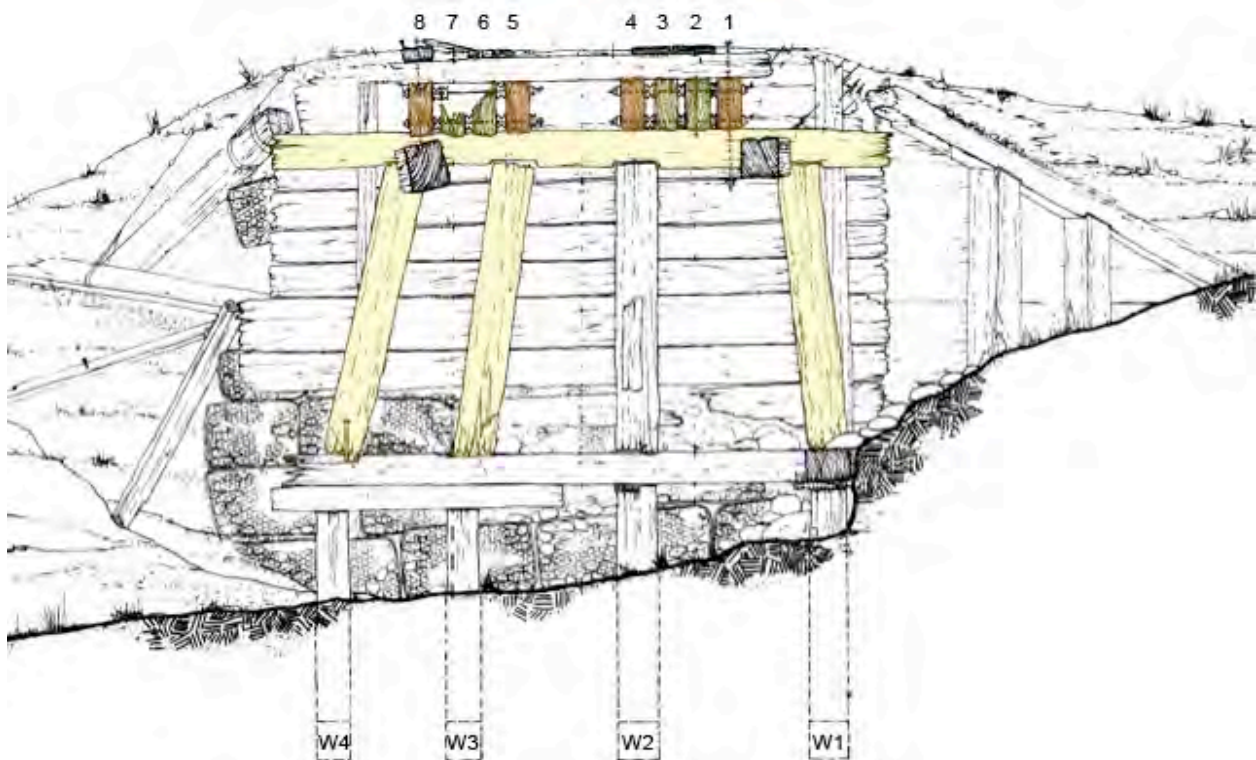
Trestle #1, west bent and bulkhead. Members shaded in yellow were replaced in-kind in entirety. Members shaded in orange were repaired. Much of the west bulkhead planking behind was also replaced in-kind. See Figures 42 - 45 in this appendix for details of repair conditions.
